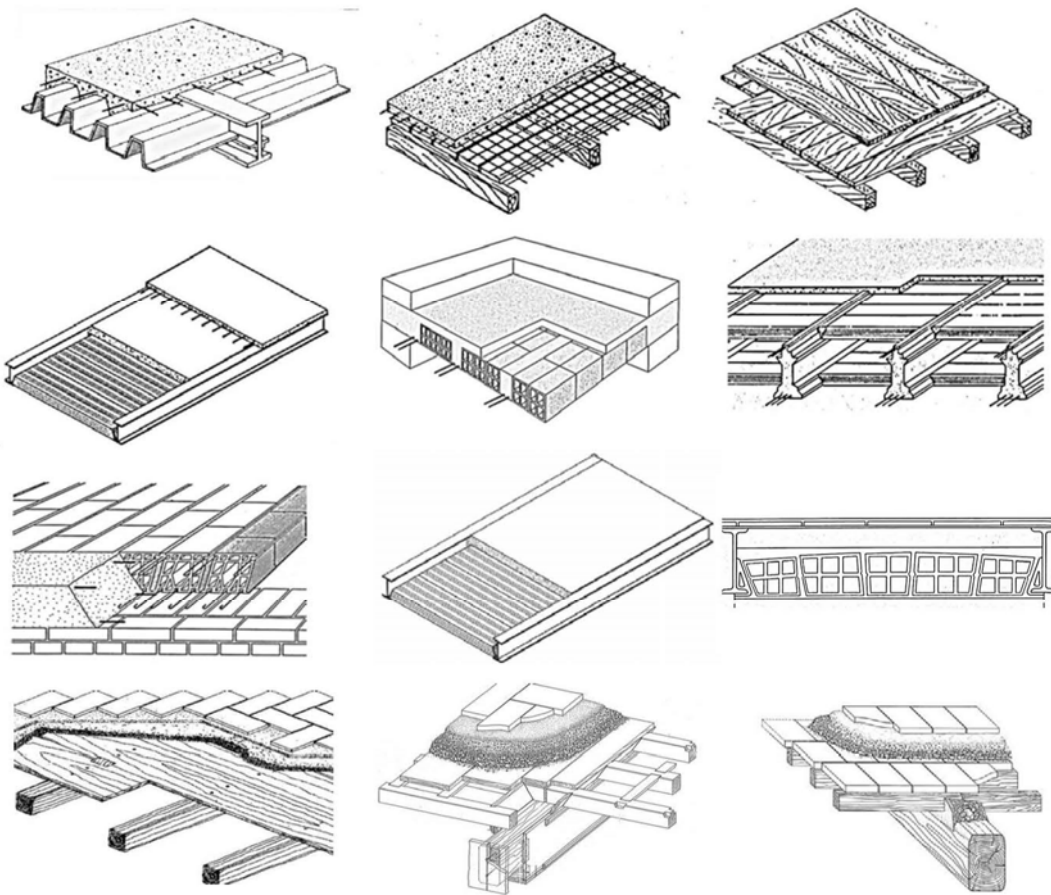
Examples of rigid, semi-rigid and deformable slab construction system details presented in: Rilevamento della vulnerabilit  sismica degli edifici in muratura, Ferrini et al. ([71] p.49-52).
